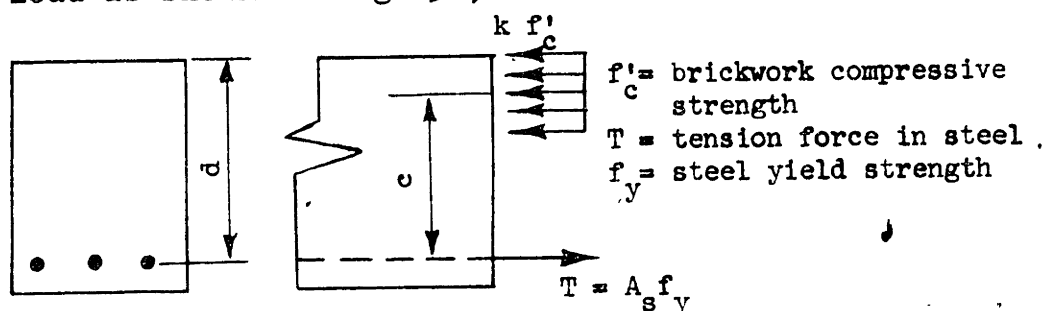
Wall Section With Assumed Stress Distribution According to Plastic Design Theory
